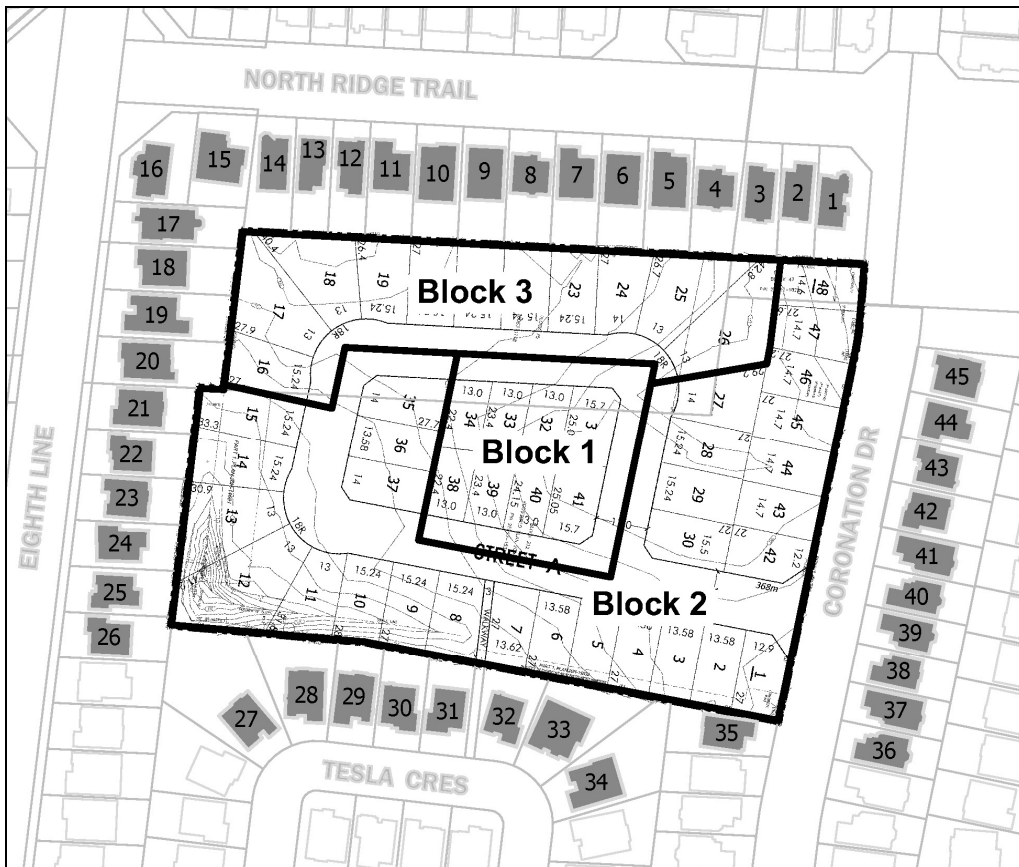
Surrounding Adjacent Lots and Proposed Zoning Blocks
